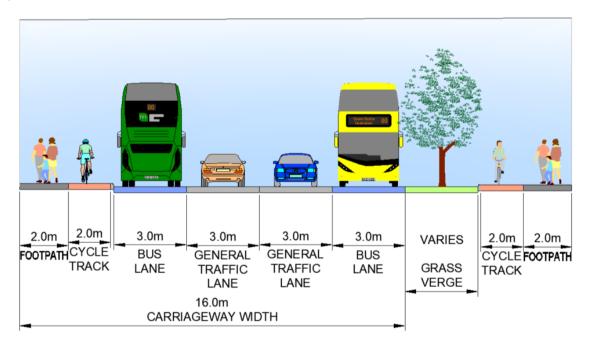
Section 2 Option 3 Indicative Cross Section
